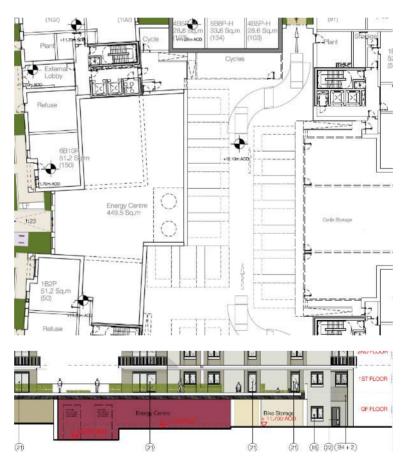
Block E energy centre plan and section courtesy of Patel Taylor
